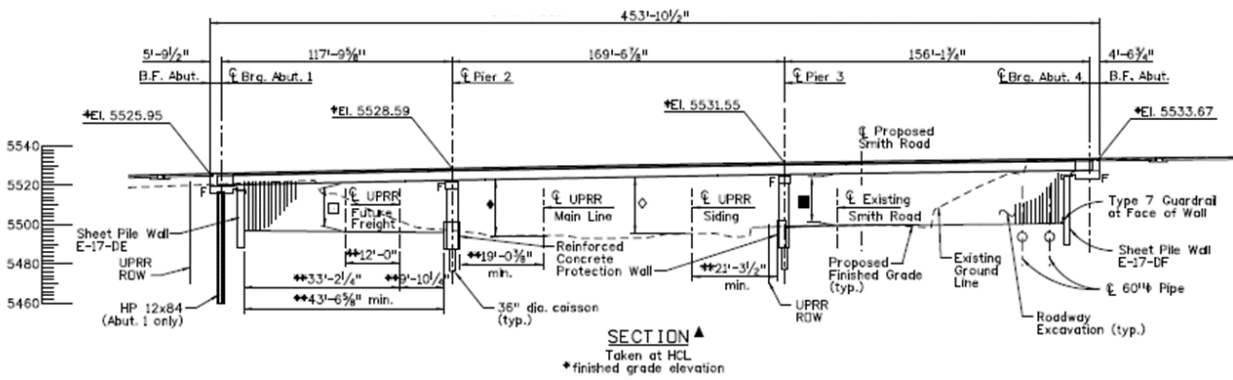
Diagram. General span layout for eastbound bridge E-17-AEJ.
